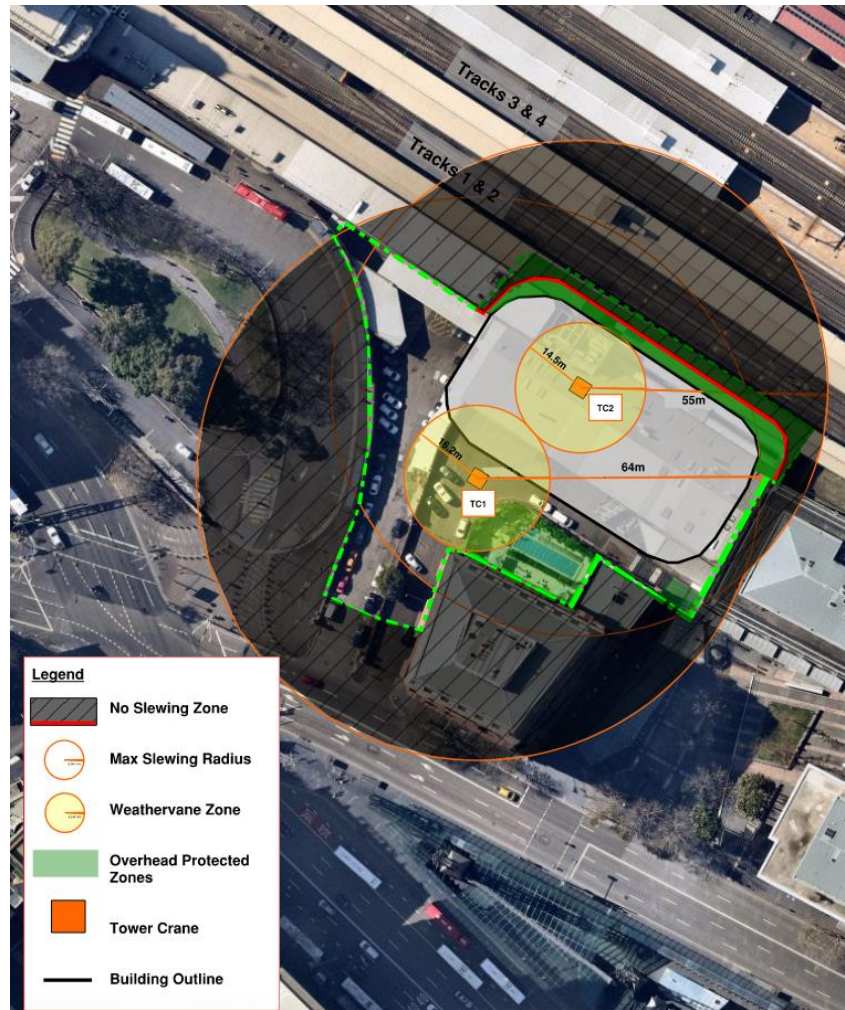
Tower Crane Locations, Slewing & Non-Slewing Zones
